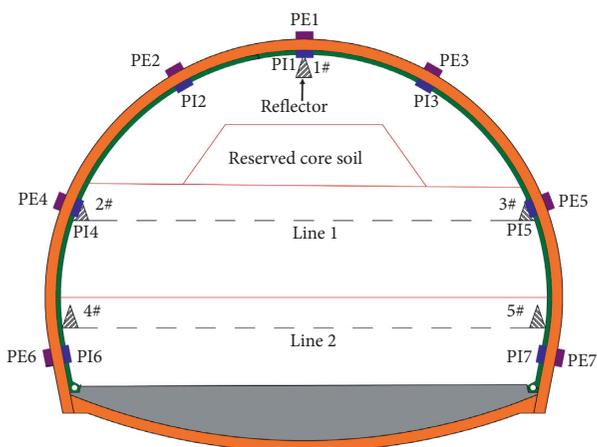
Layout of deformation measurement for stepped tunnel.
